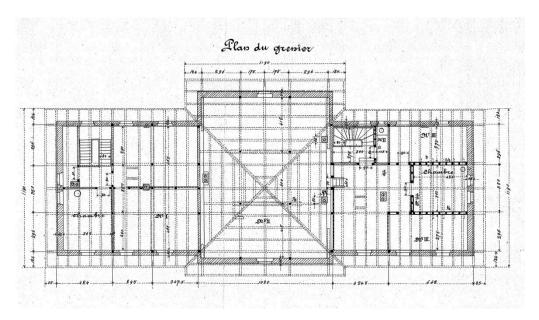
Ist class station building project drawn for Konya / Roof plan
